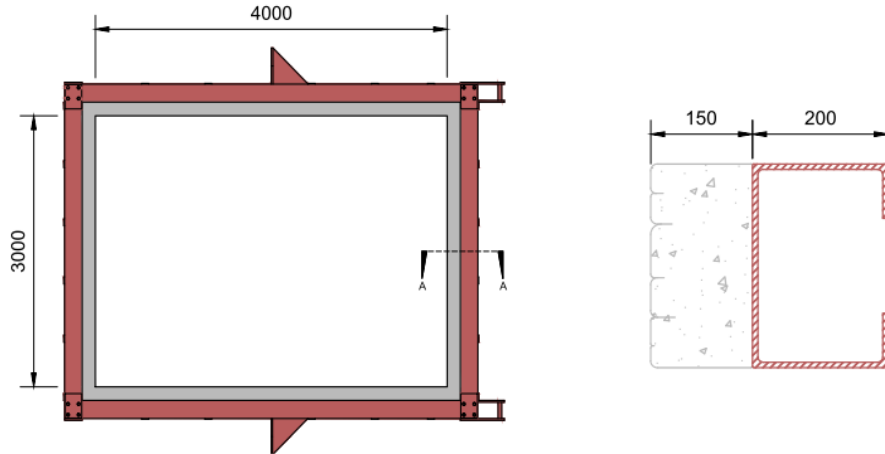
Test frame plan (left), Loading frame cross section A-A (right). Grey: Concrete, Red: Steel
